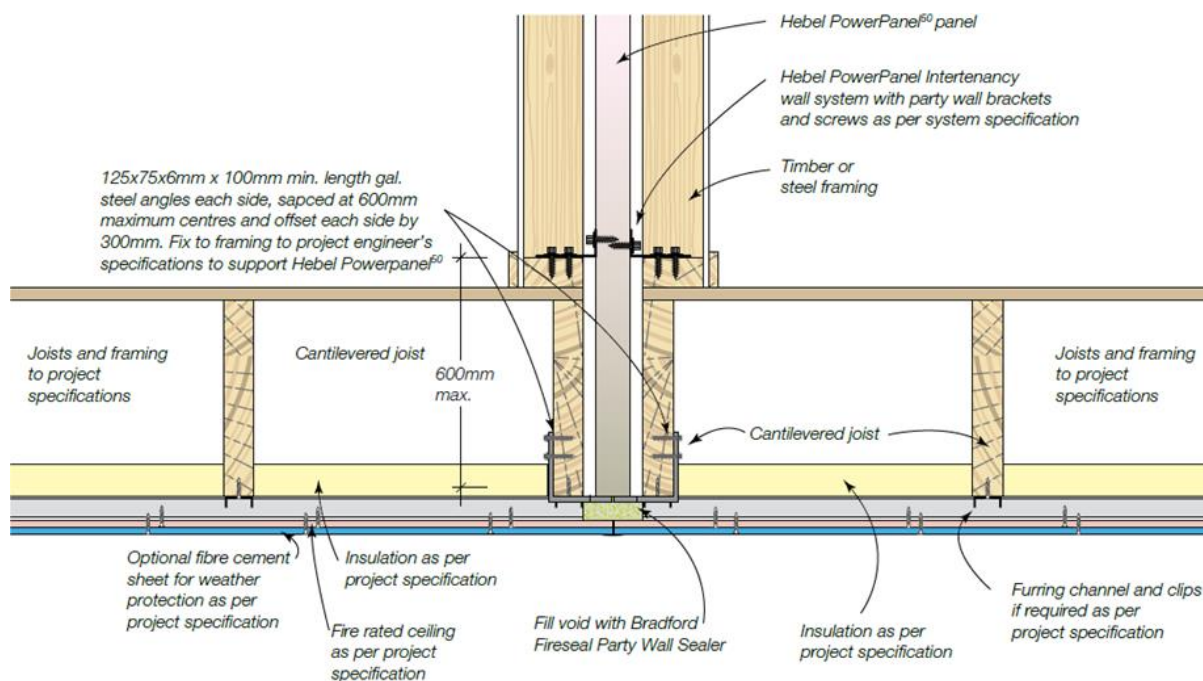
Cantilevered intertenancy system supported with steel angles – level soffit – 2
